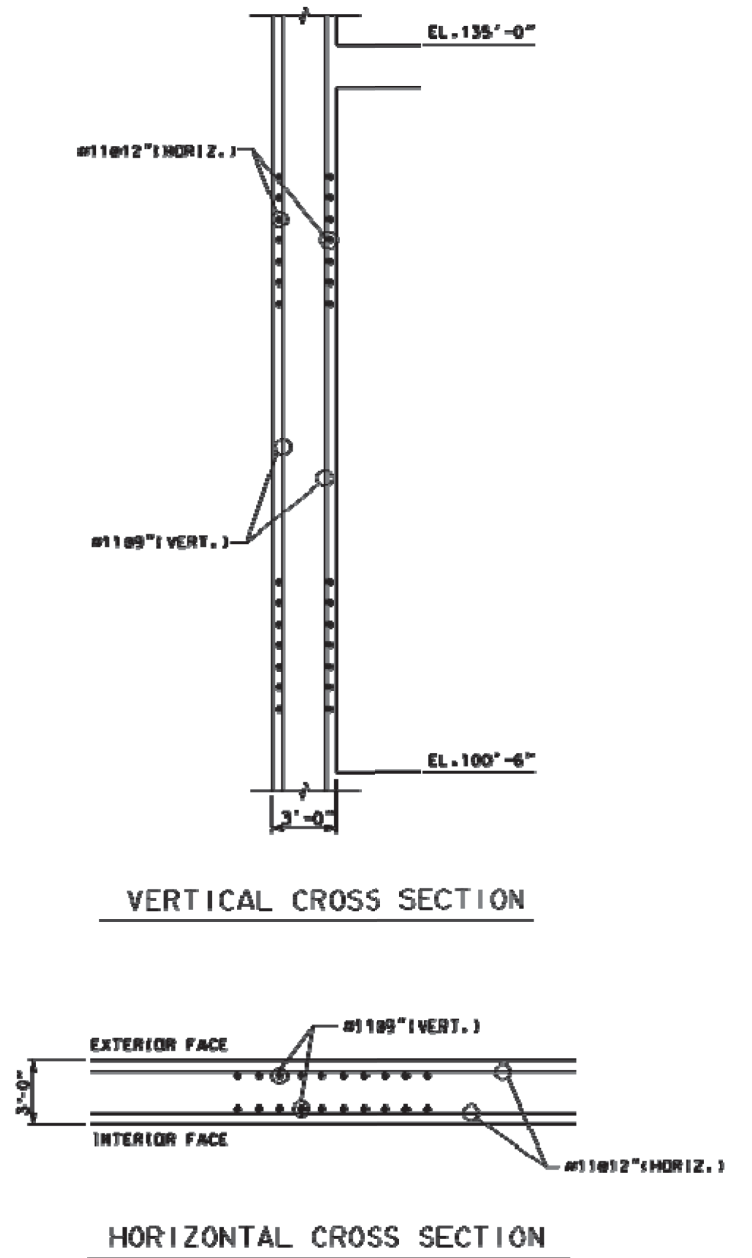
A-56 Reinforcement Arrangement of the West Wall of the EDG Building
